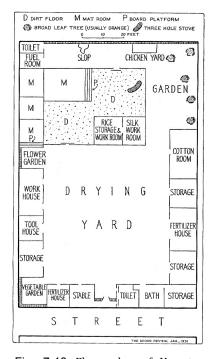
Floor plan of Yamato house type showing the house and outbuildings.
